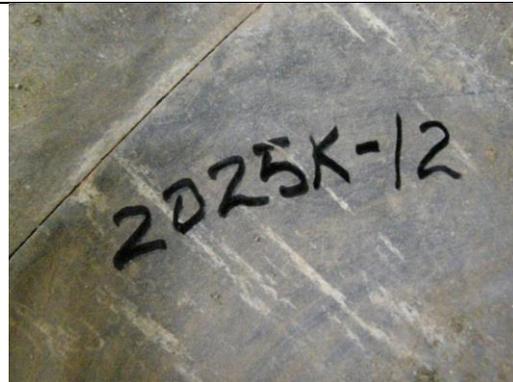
Floor Tile (2025K-12) Basement, Floor.
